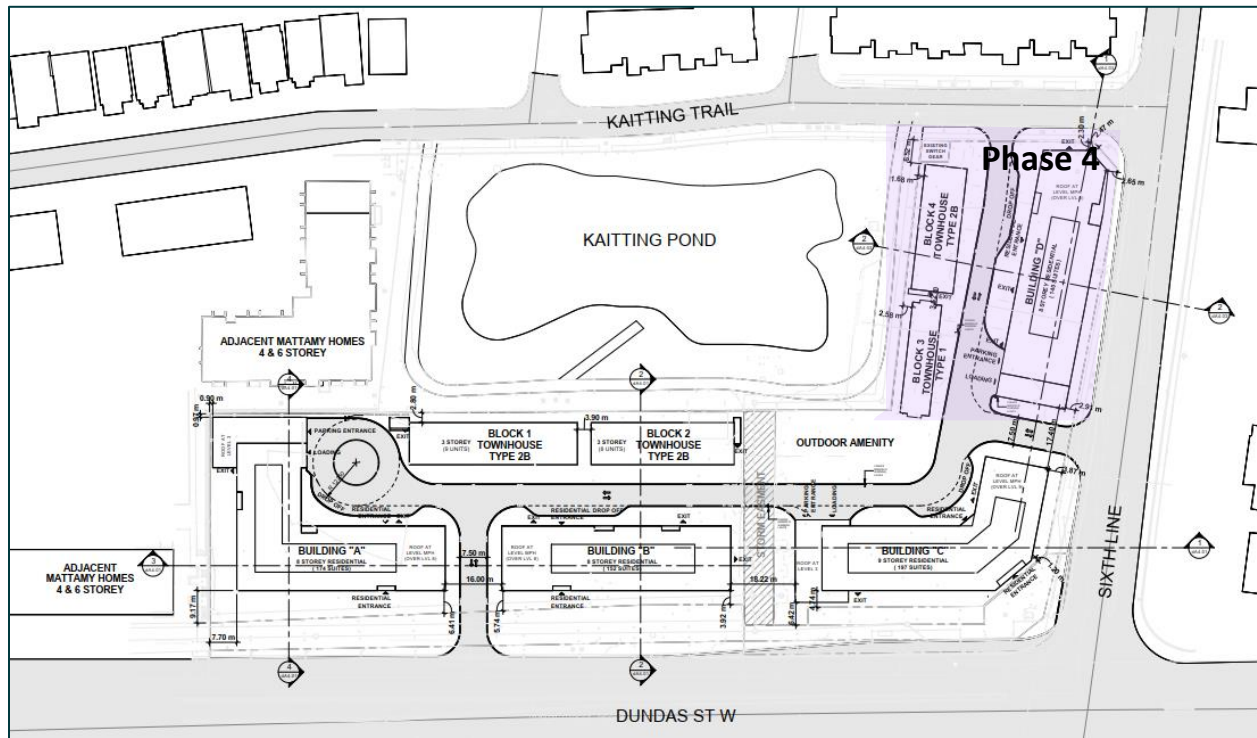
Ultimate Site Plan (Kirkor Architects, December 2024)
